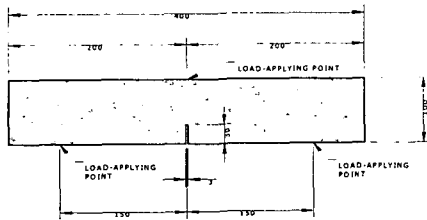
Dimension of specimen for bending test (Notch 3 cm)
